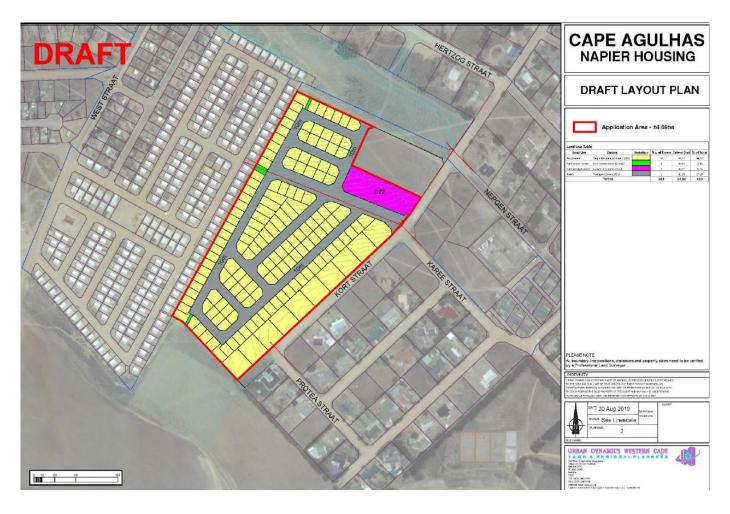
Site plan depicting the proposed development on the Remaining Extent of Erf 513, Napier
